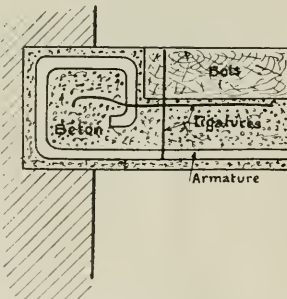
GERMAN STEEL-WOOD REINFORCED-CONCRETE BEAM
